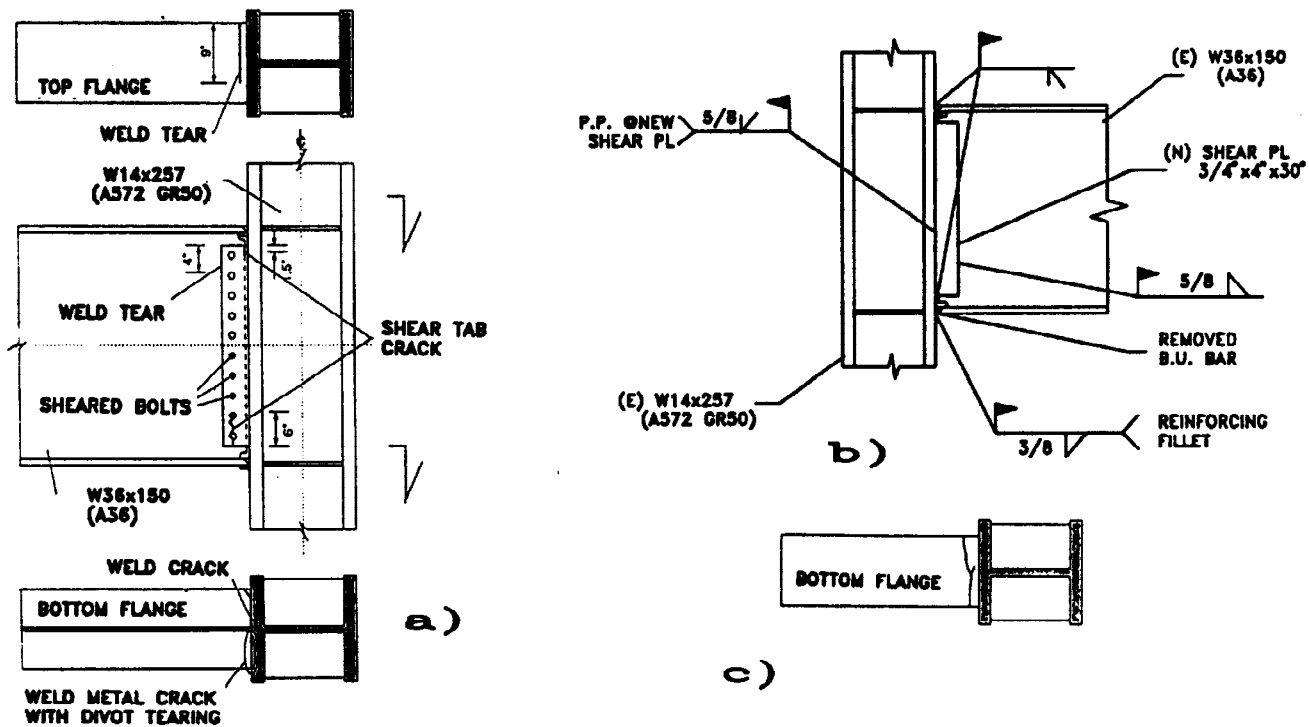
Specimen 3 -- Damage, repair, and damage of repaired connection
